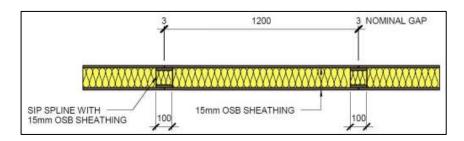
Indicative Construction Detail for Roofs in Table 18 to Table 20
